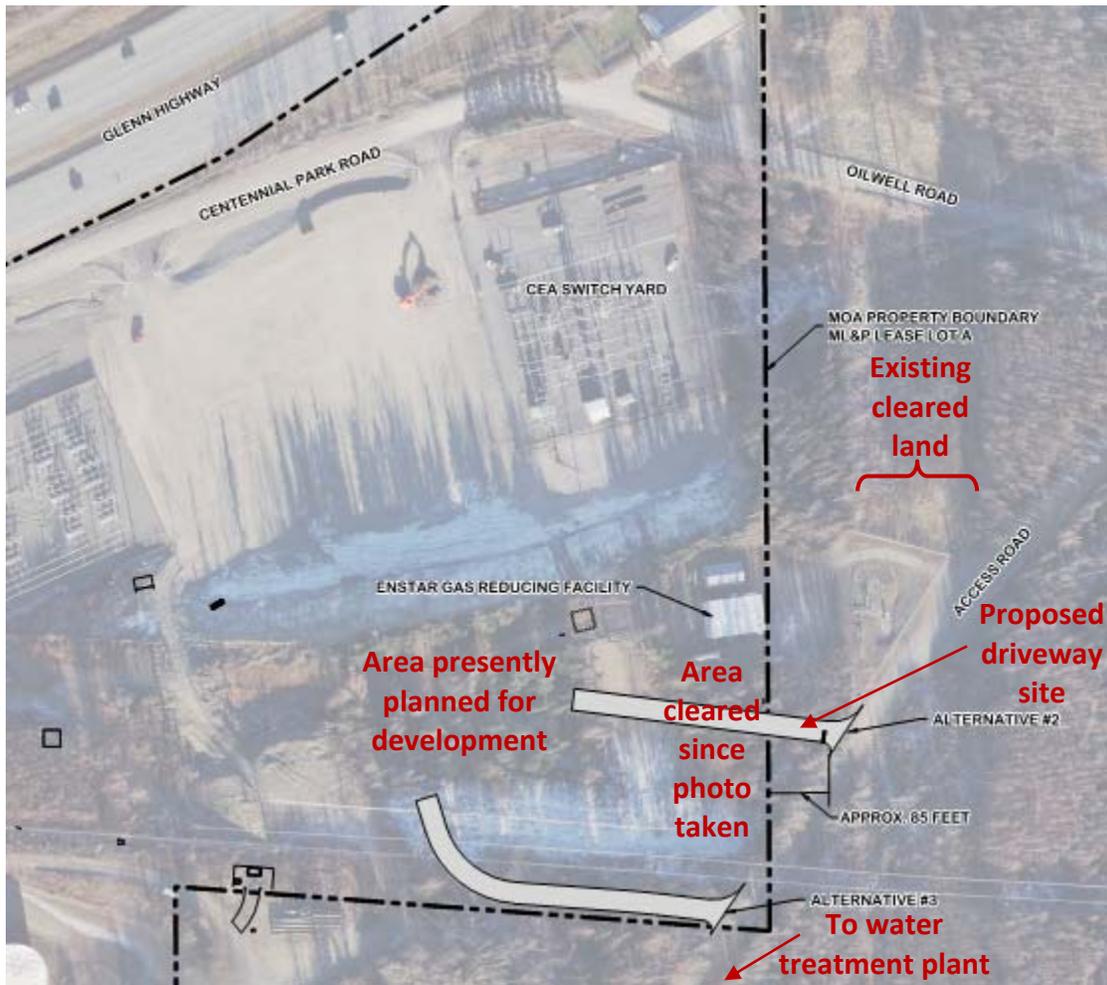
Proposed driveway site in the context of northeast Anchorage Bowl
